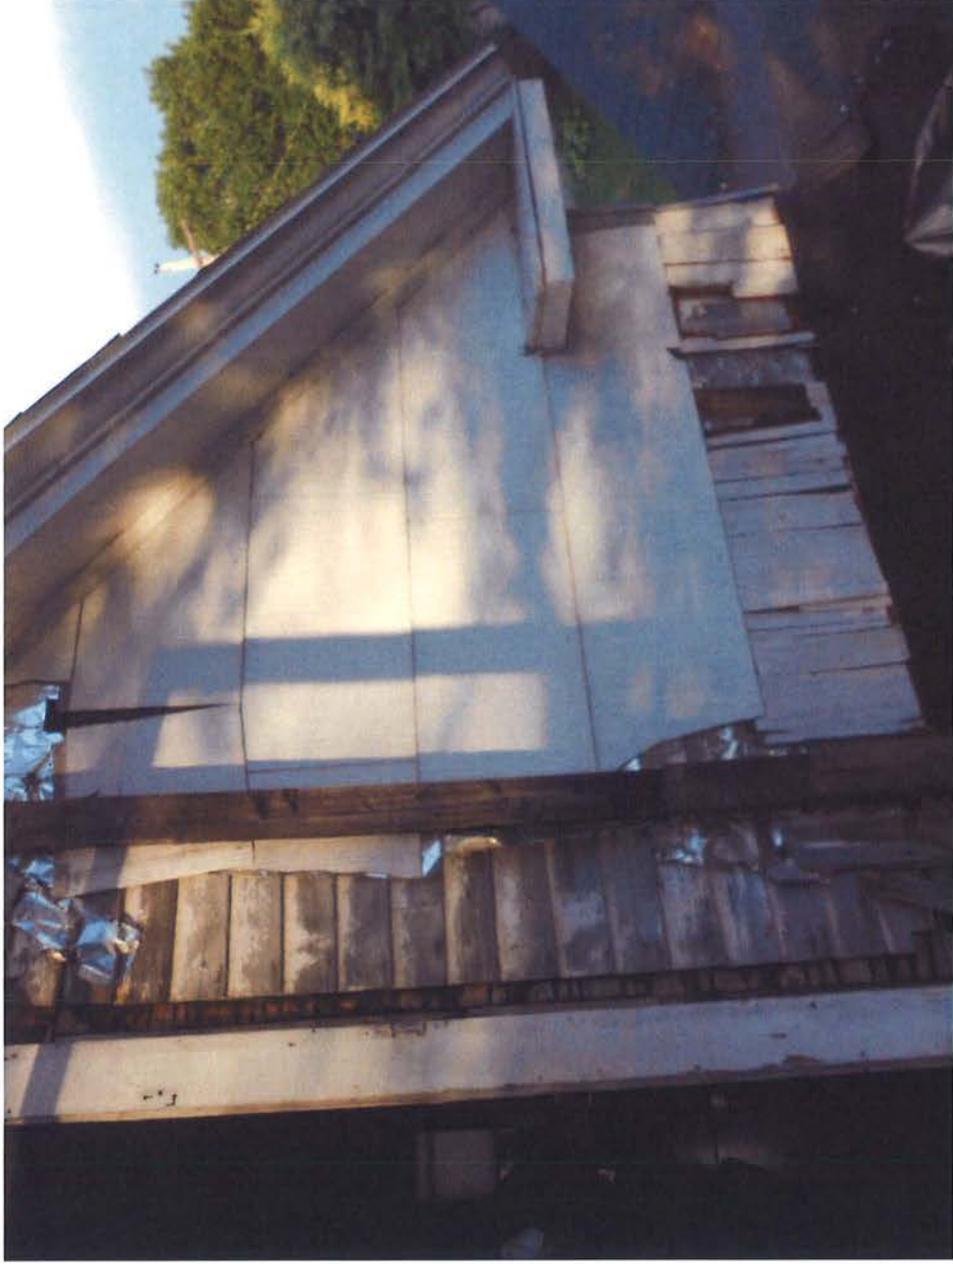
shows damage and frayed asbestos siding creating hazardous conditions and openings through the exterior finish materials into the structure allowing the entry of the elements.
